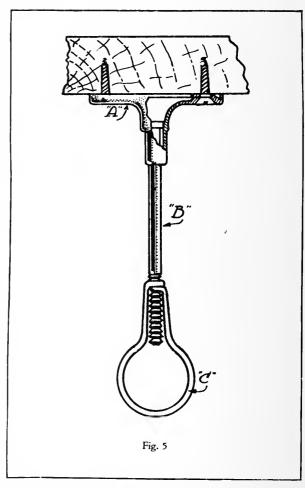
is a view of an adjustable hanger used quite extensively. "A" is the foot piece hung to the ceiling by screws, "B" is the rod with a long thread for adjusting and "C" is the ring for the pipe.
